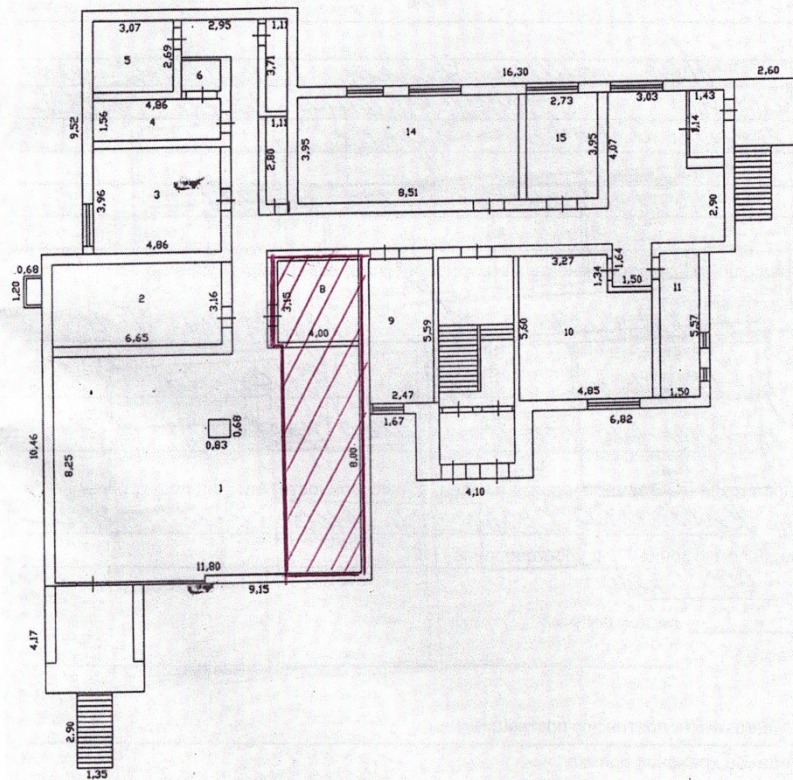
is a detailed architectural floor plan of a building, showing 16 numbered rooms and their dimensions. The plan includes a staircase located between rooms 15 and 16. The dimensions are as follows:
